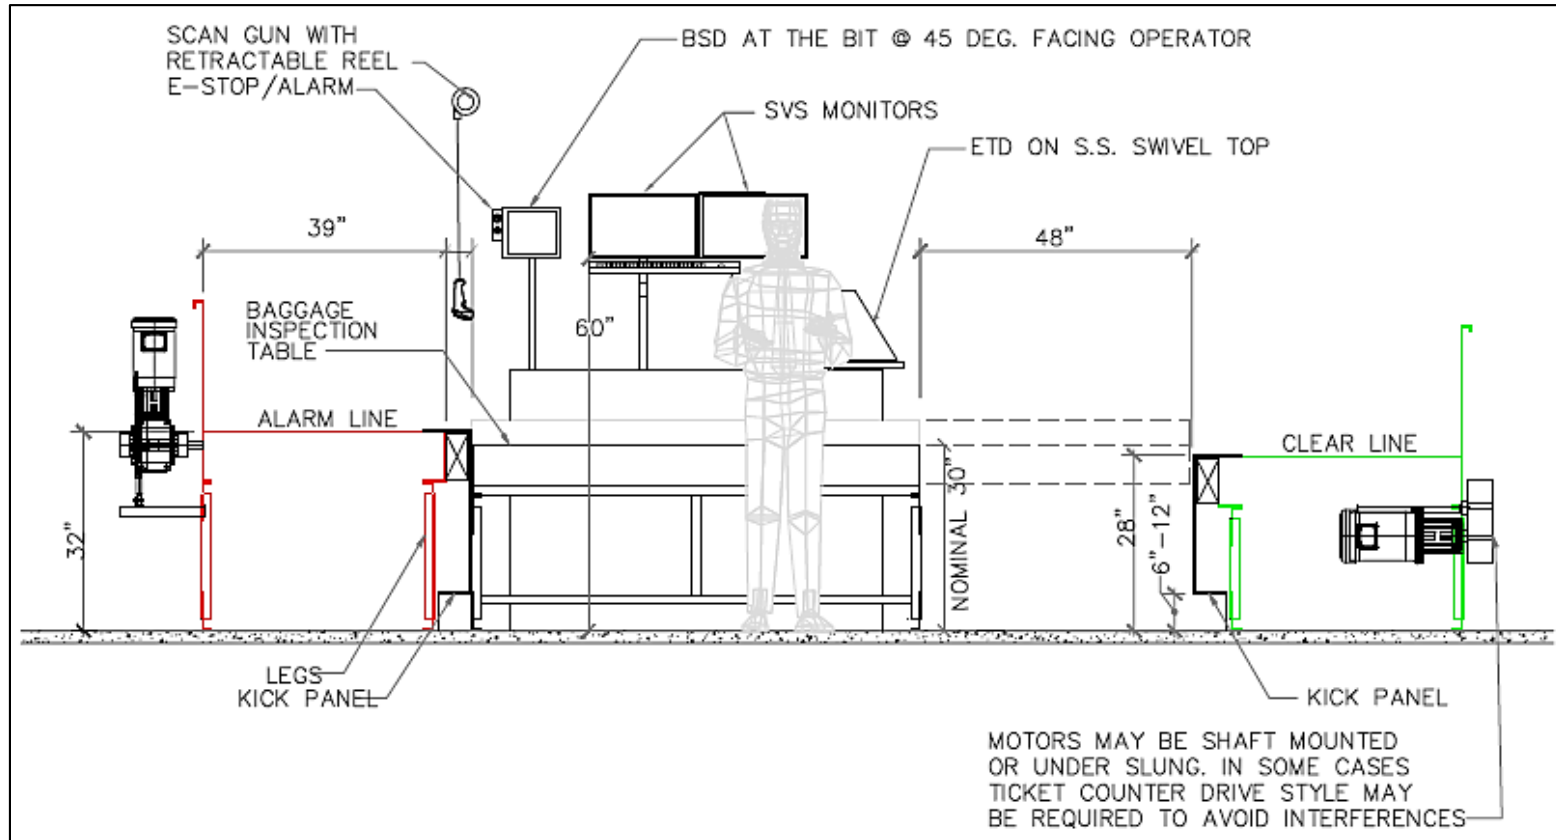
Isometric View of Example Baggage Inspection Station
